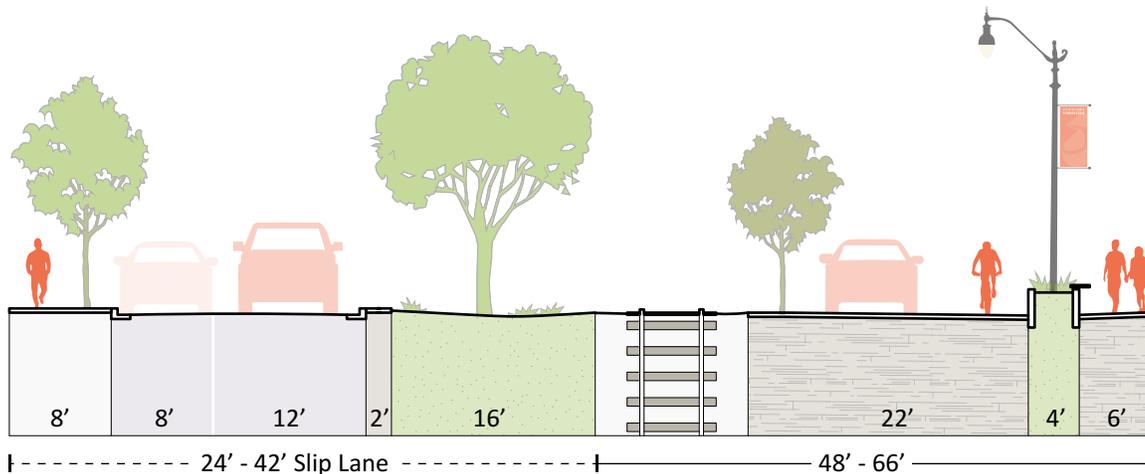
B (1). Hydraulic Street (Long-term).
